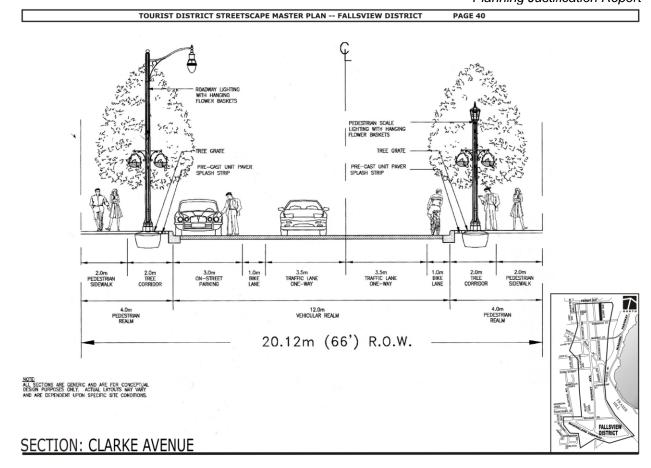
Clark Avenue Streetscape Design Visualization (Source: City of Niagara Falls Streetscape Master Plan and Urban Design
